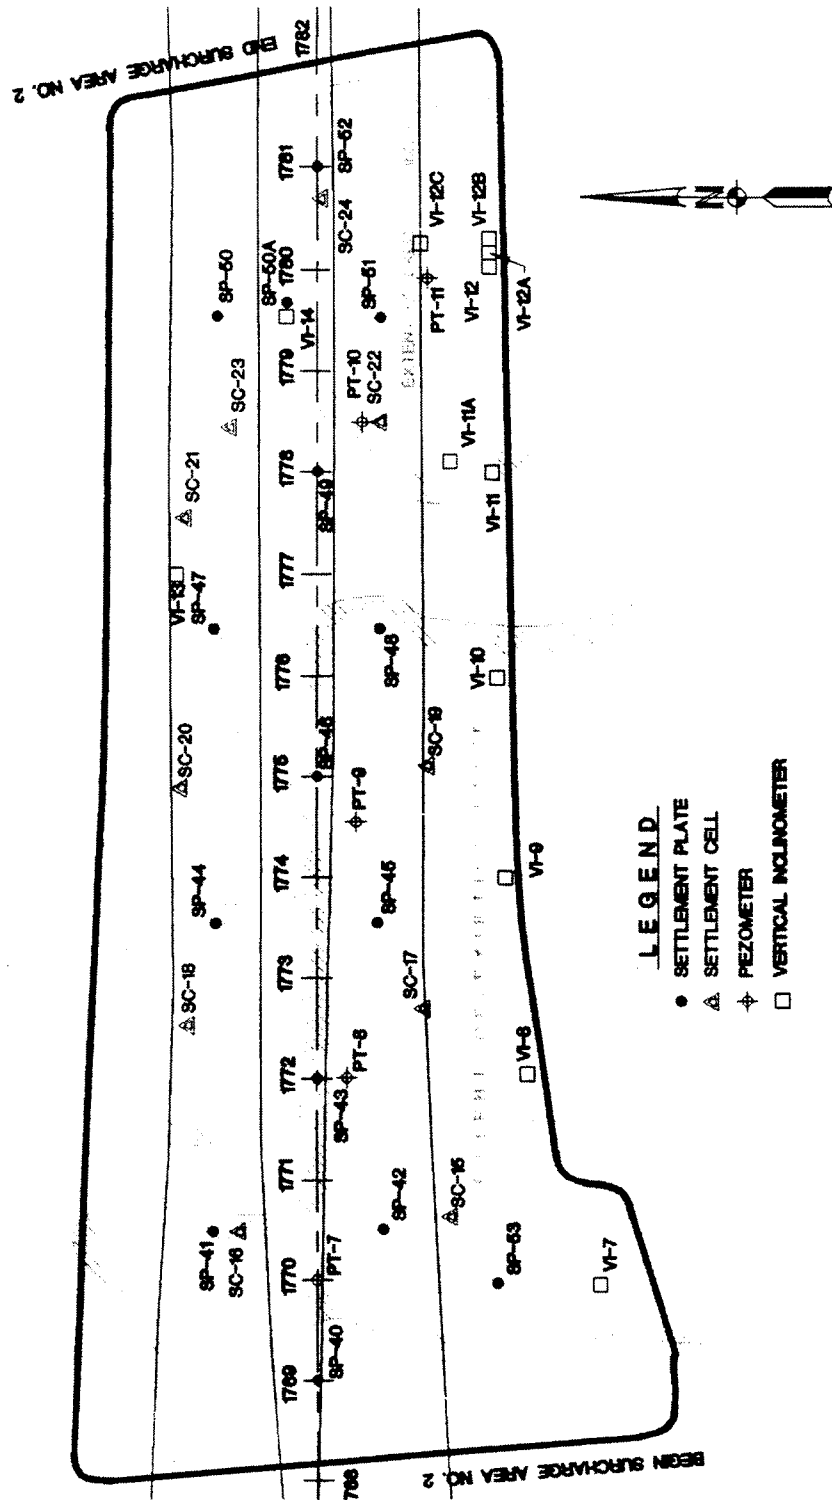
Instrumentation plan : surcharge area no. 2 of Polk County Expressway, Section 5
